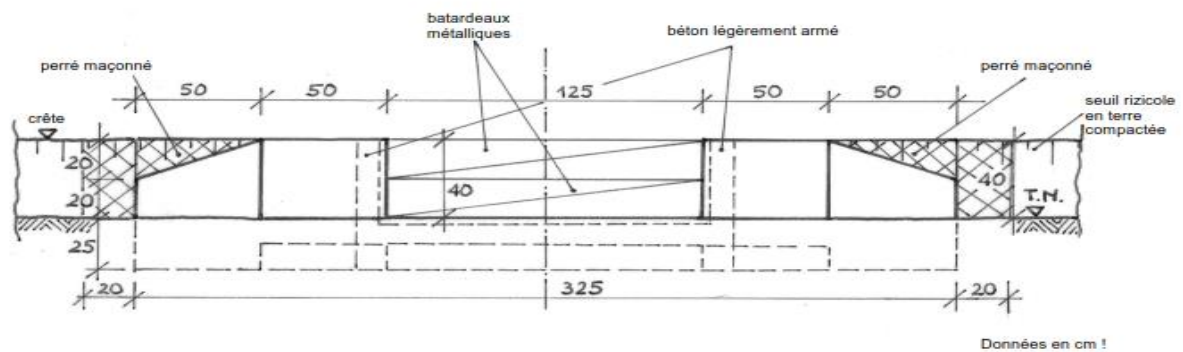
Drainage structure for standard weir (Structure seen from downstream)
